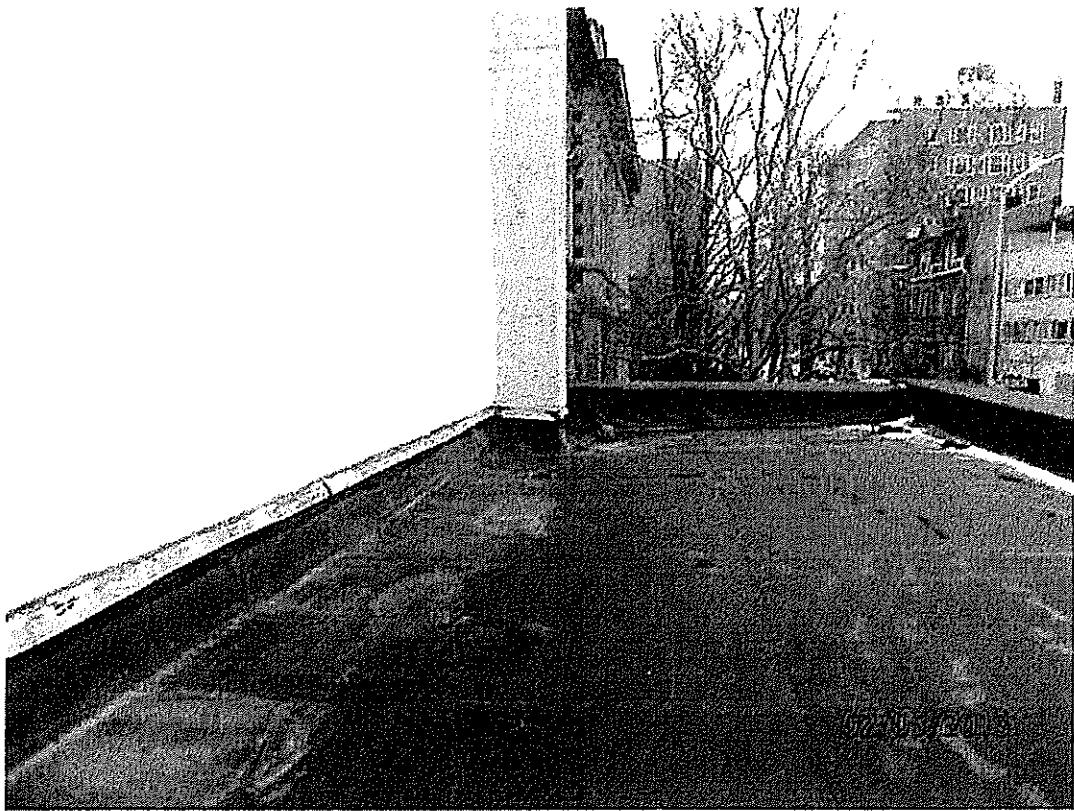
Roof View 2140 Market Street, Philadelphia, PA
